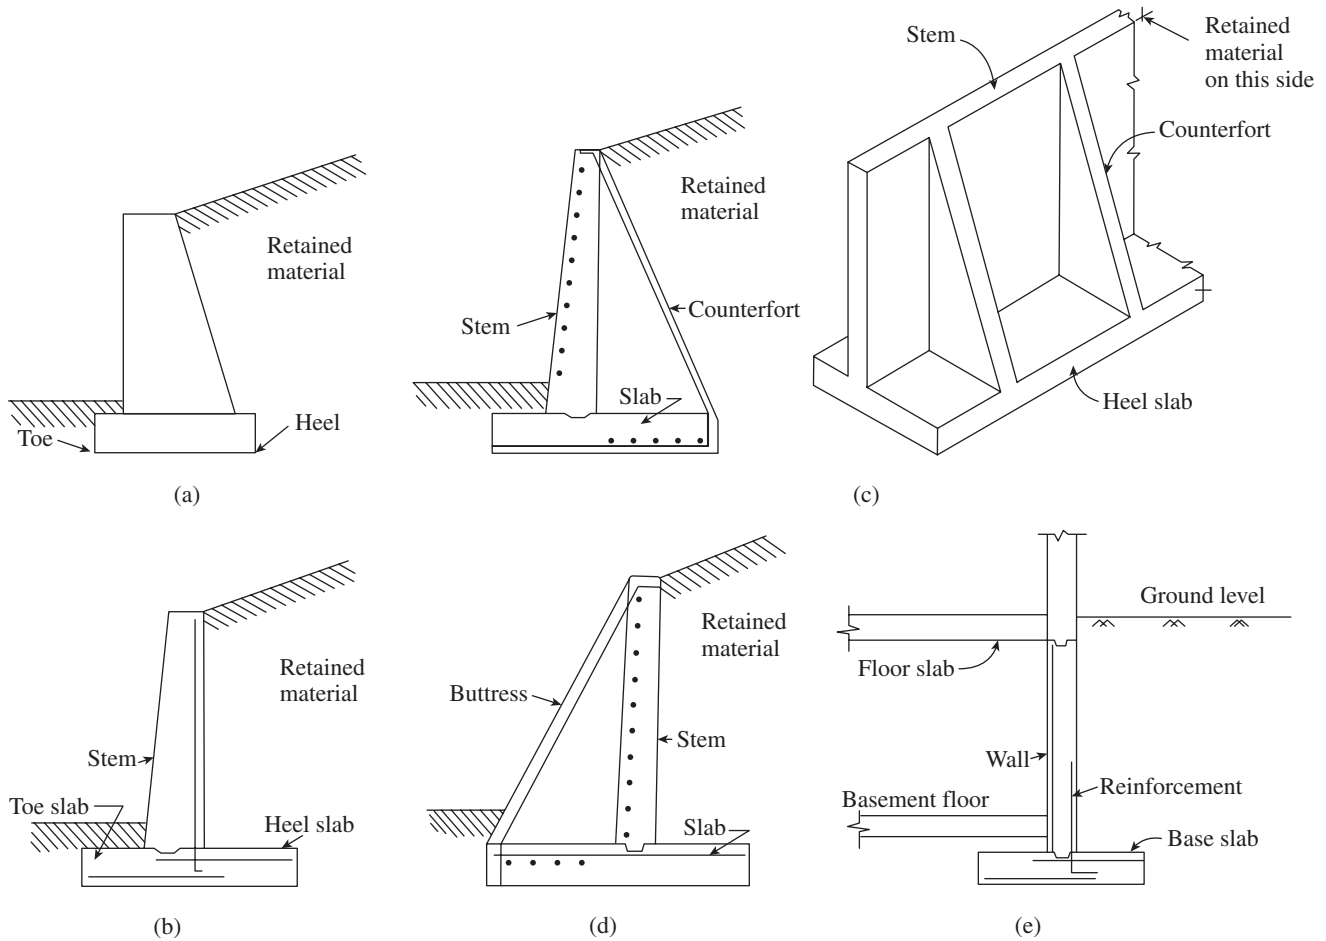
Types of retaining walls (a) Gravity wall (b) Cantilever retaining wall (c) Counterfort wall (d) Buttress wall (e) Basement wall
